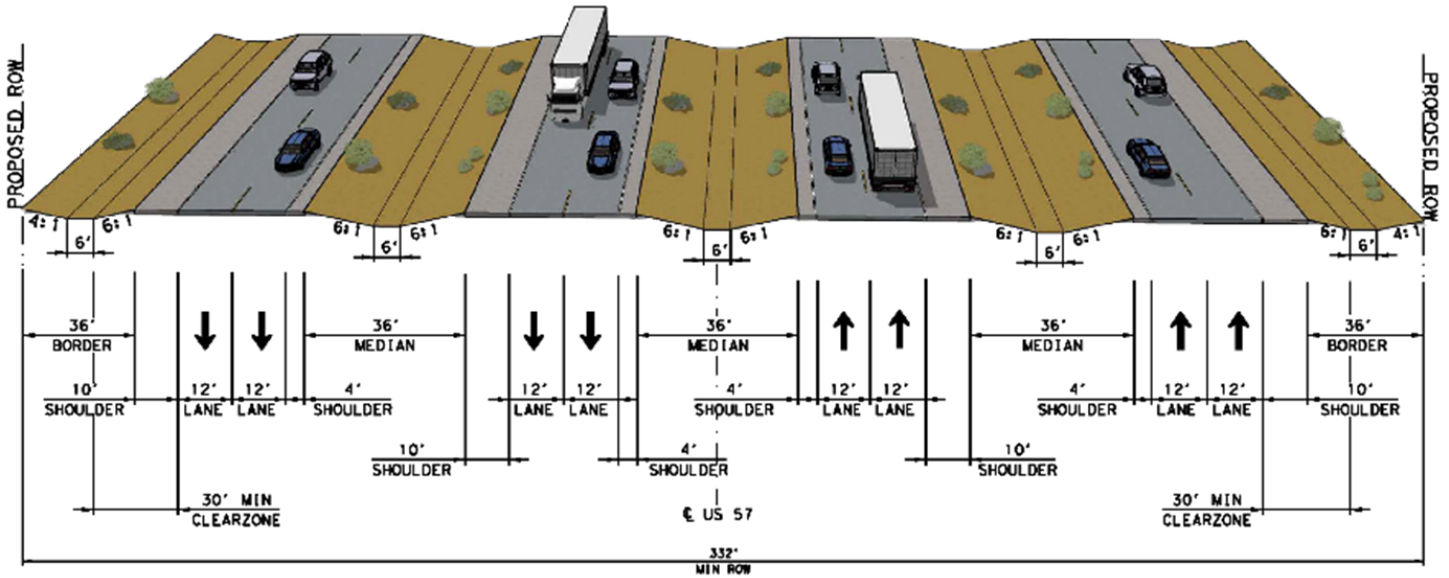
Proposed Interstate Highway Typical Section (With Frontage Roads)
